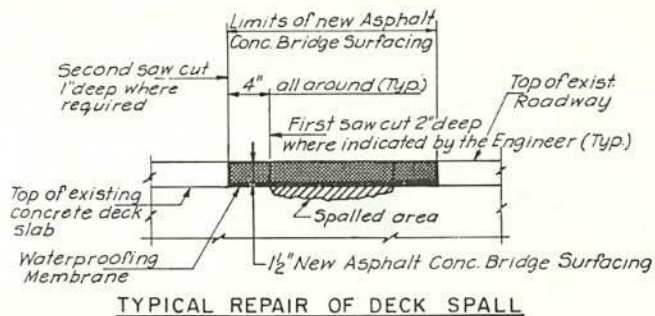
Detail of repair procedure from contract plans for bridge deck repairs on the New Jersey Turnpike.
